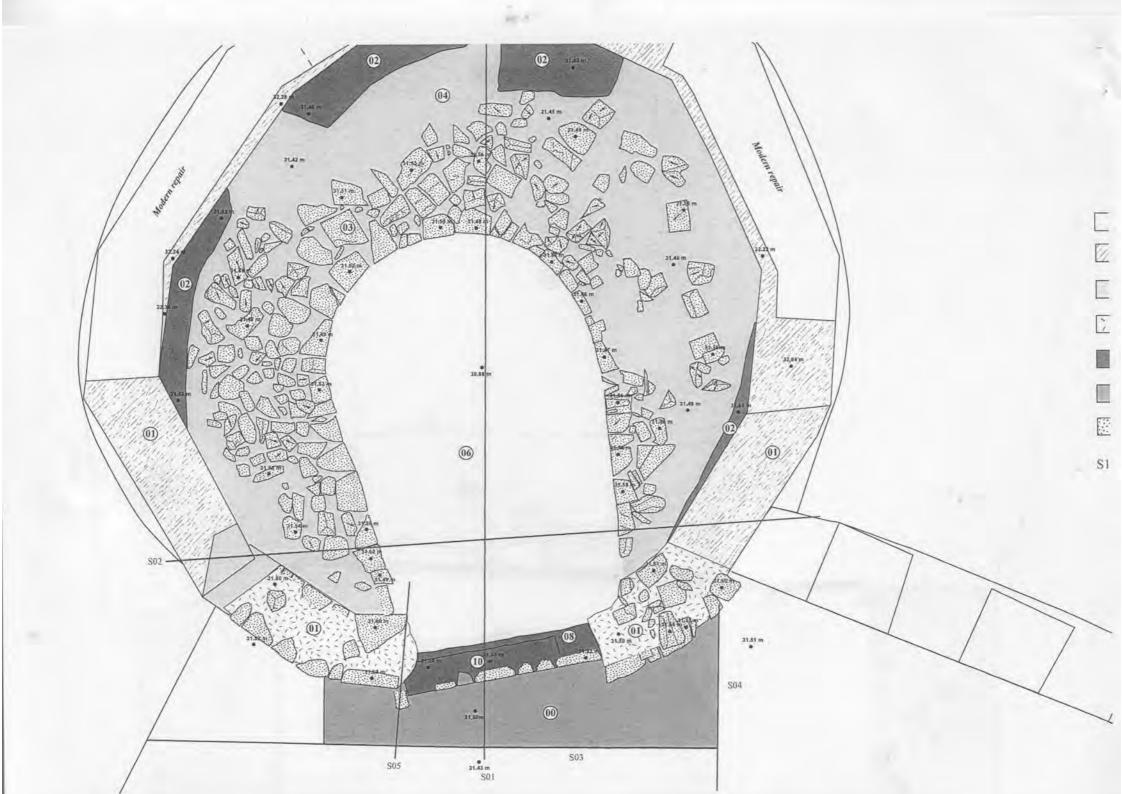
T1, plan of the foundations of the medieval wall (CAC 2007, fig.3)
